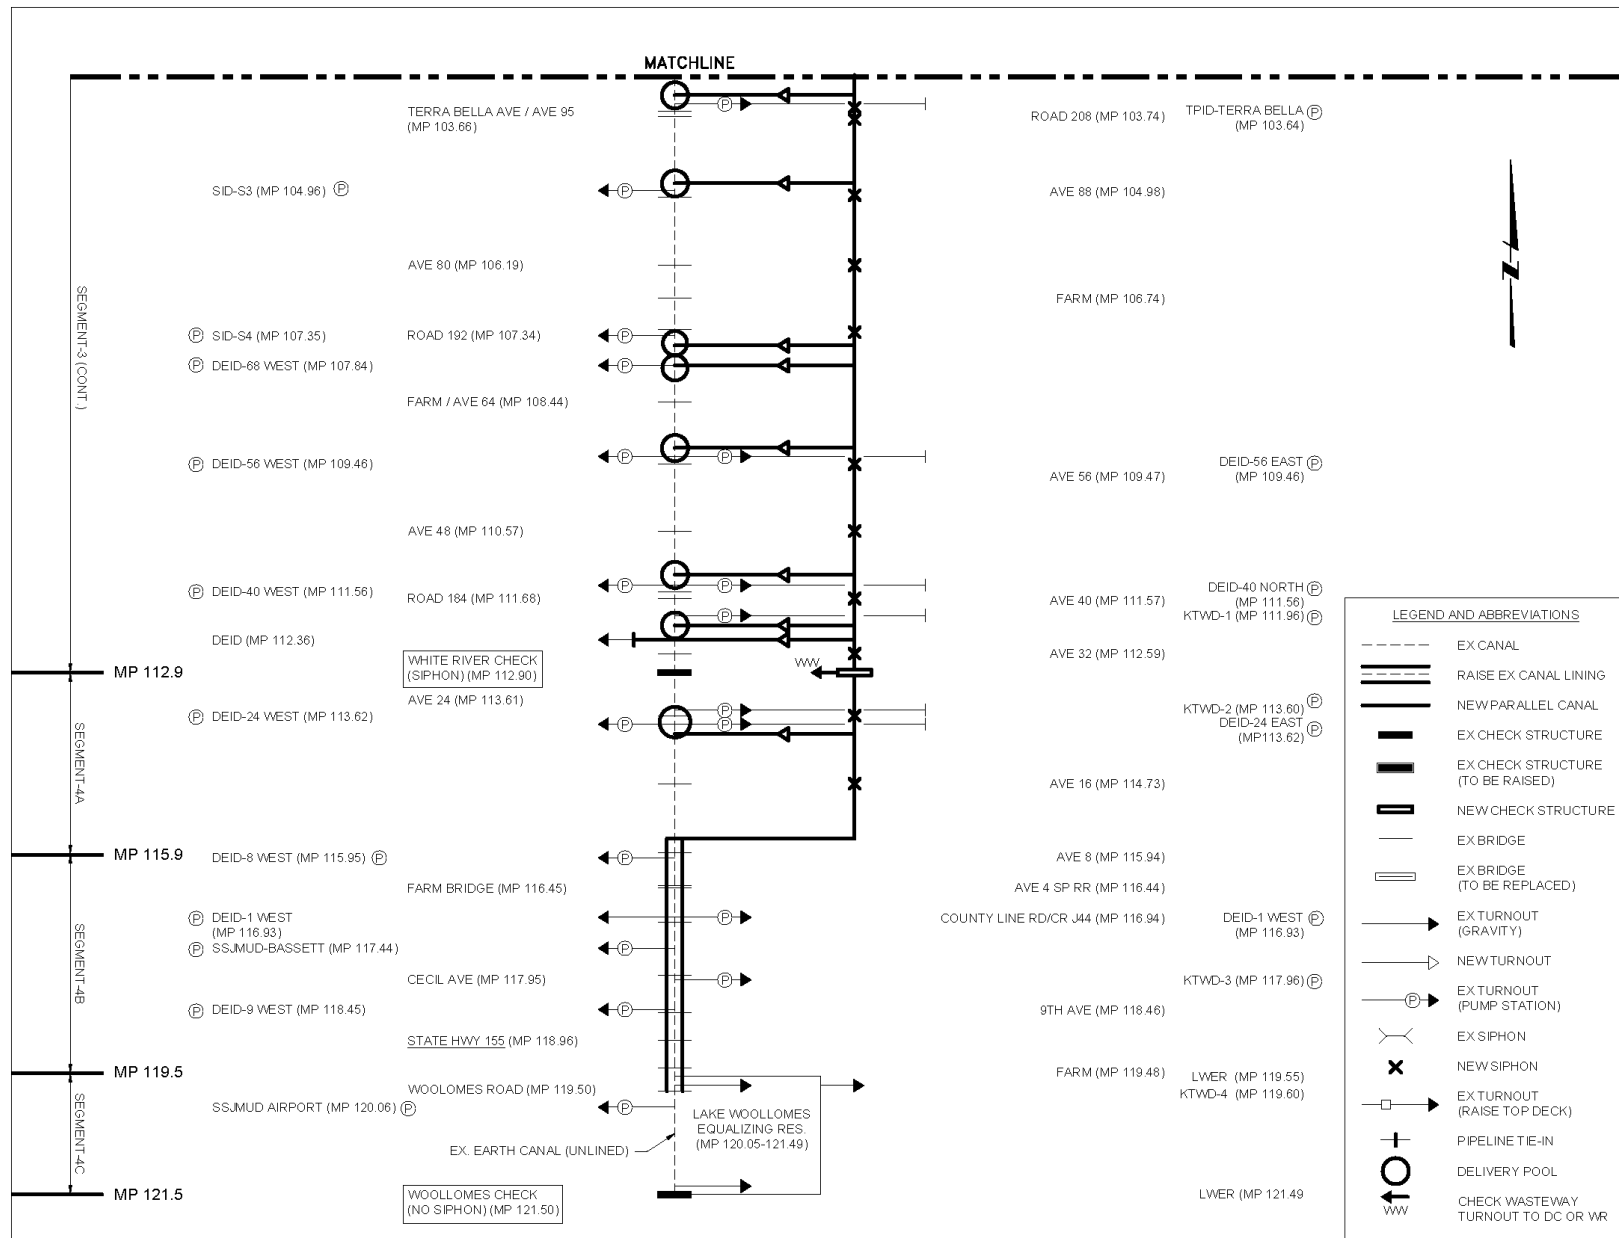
B. Recommended Plan Single-Line Diagram of Segments 3 and 4
